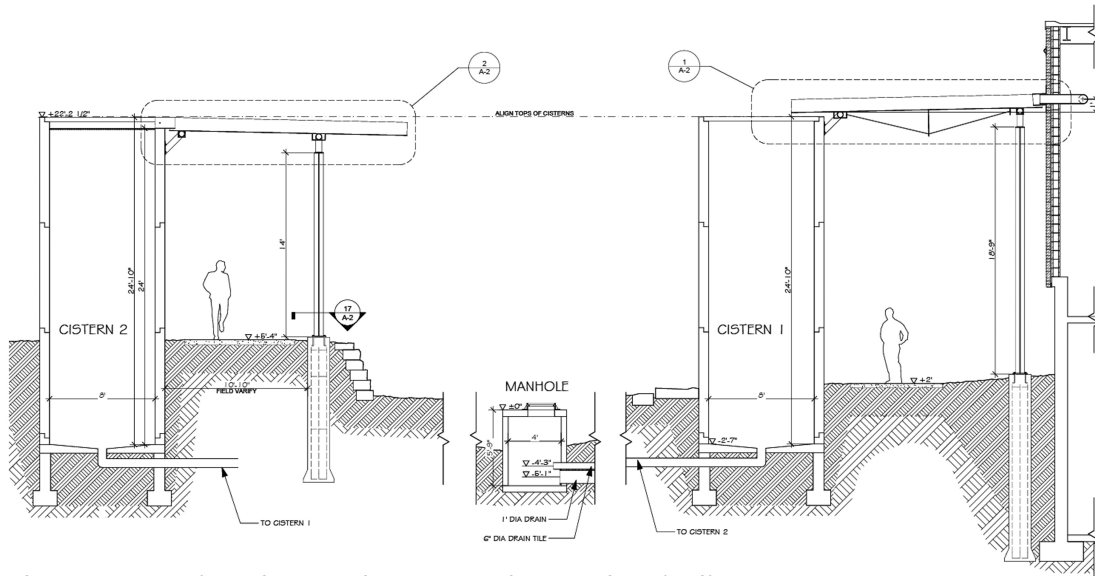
Power Plant Cistern Project Construction Drawing (detail)
